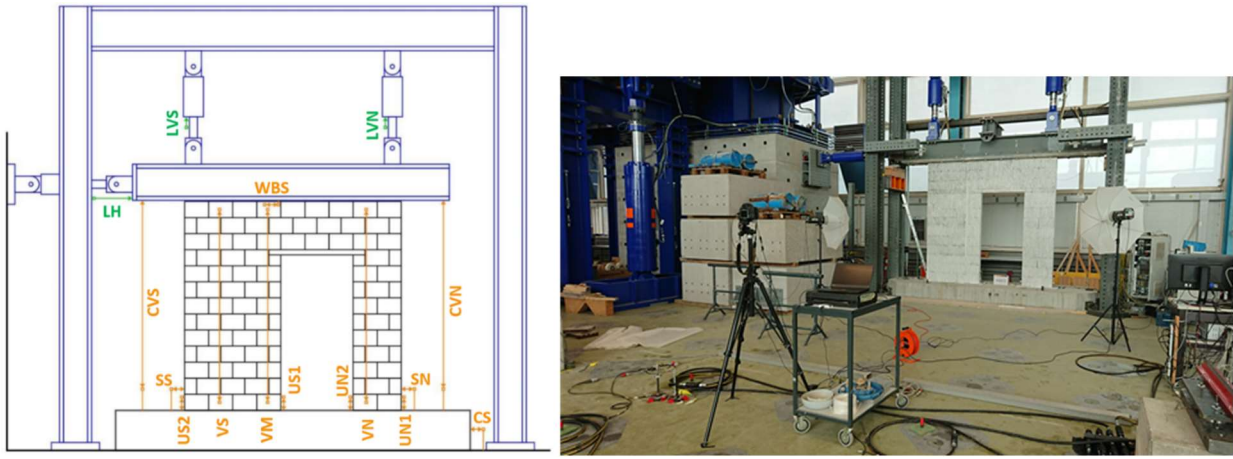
LVDTs instrumentation layout (left) and DIC installation (right)
